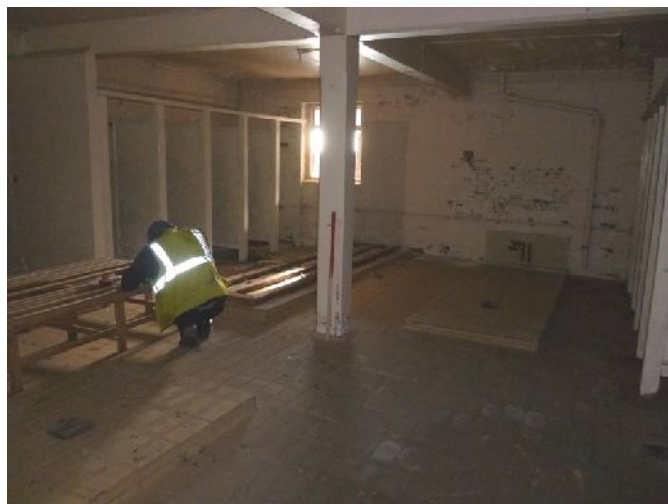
(left): General view of North Building, Ground Floor Room 4 from the south-east
